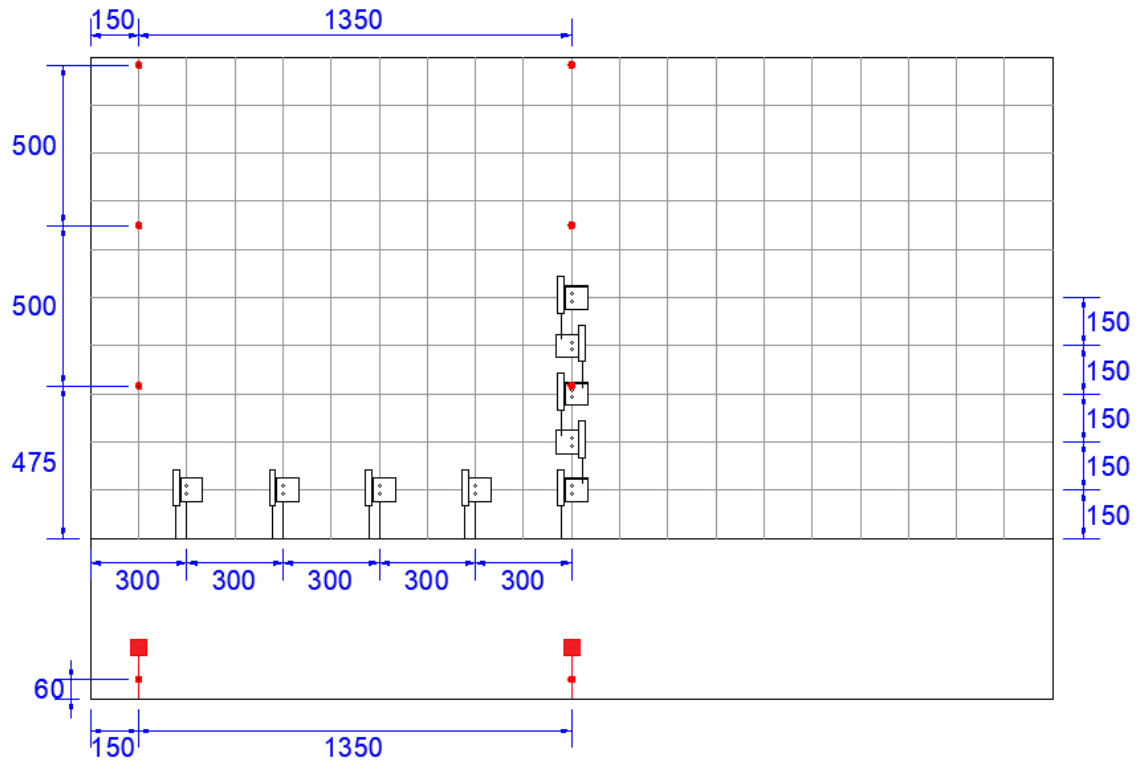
Rear view (compressive side) of the specimen showing instrumentations
